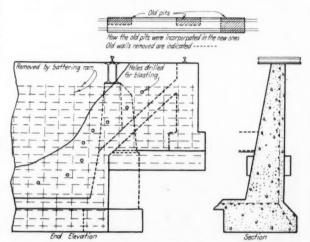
End View of the Old Double-Track Pit Showing How the Old End Wall Was Removed
